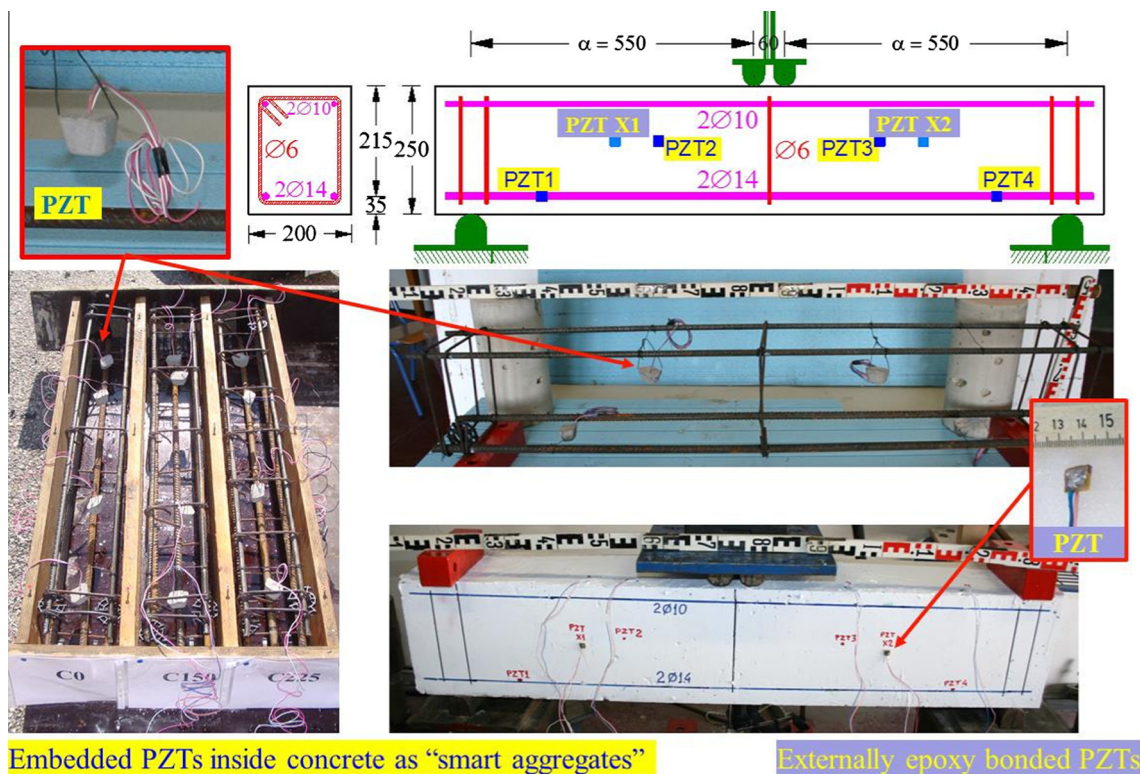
Typical characteristics (geometrical, reinforcement and PZT transducers) of a tested shear-critical reinforced concrete beam.
